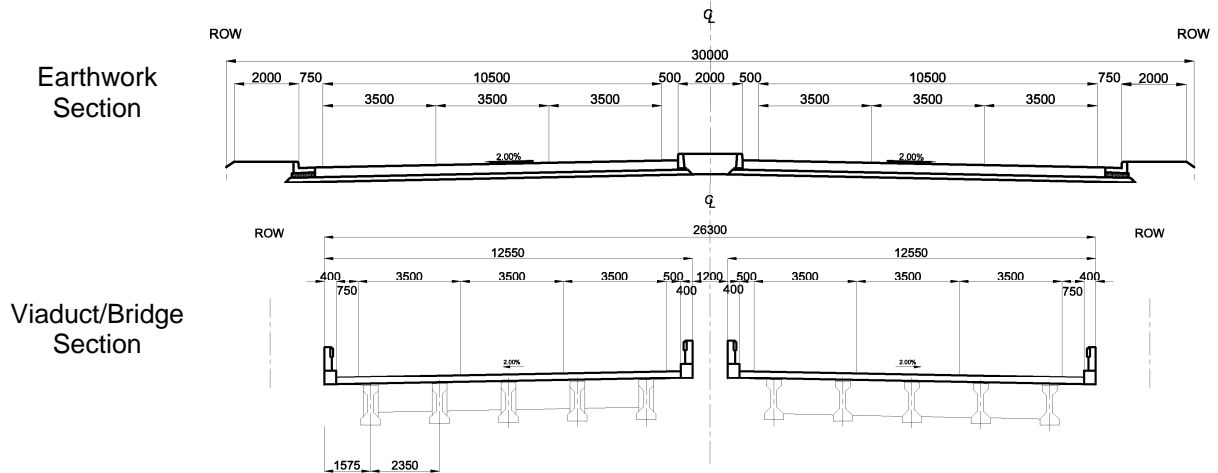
Proposed Typical Cross Section for Daang Hari Road
